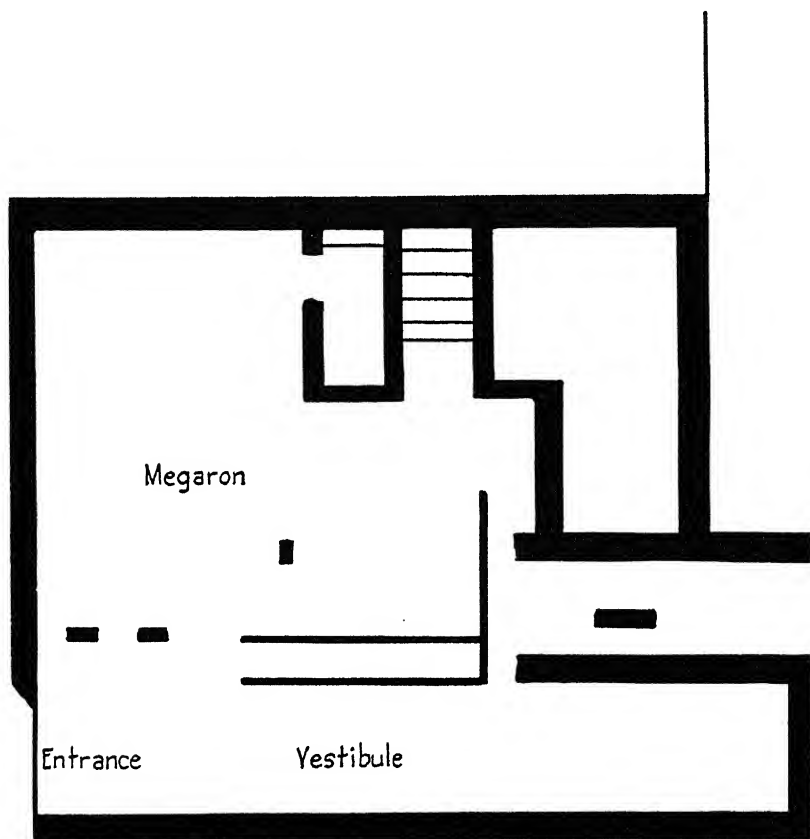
PLAN, HOUSE ON THE ISLAND OF PSEIRA
